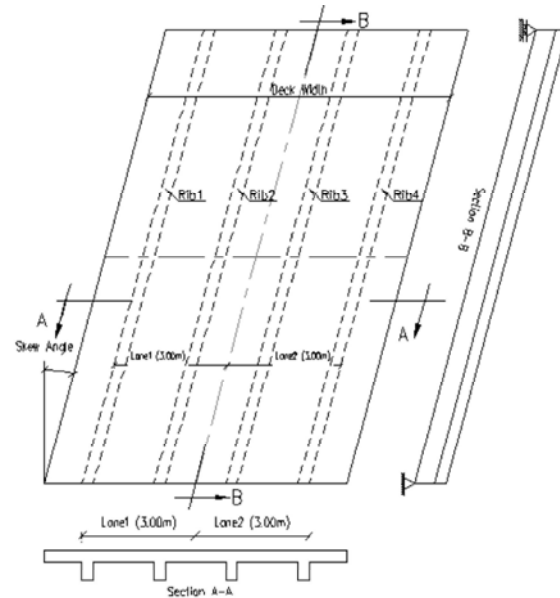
Layout and geometrical shape of skewed bridge decks.
